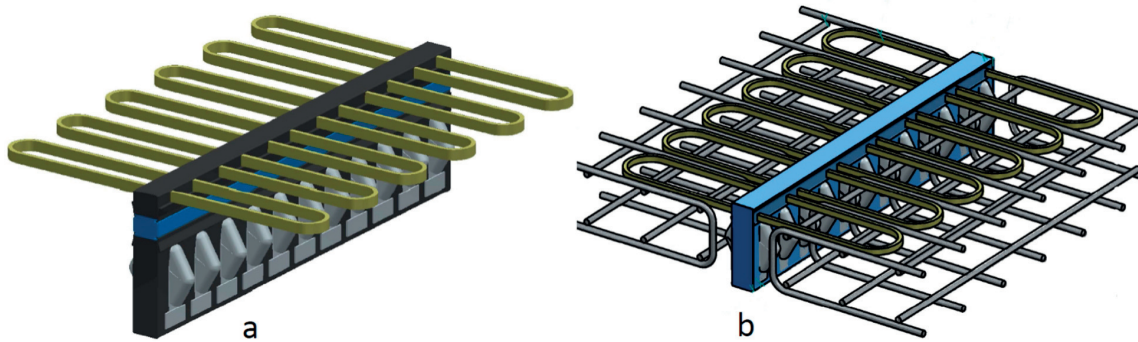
New thermally-insulated A/GFRP thermal break: a) prefabricated element, b) element placed from top into pre-installed concrete slab reinforcement.
